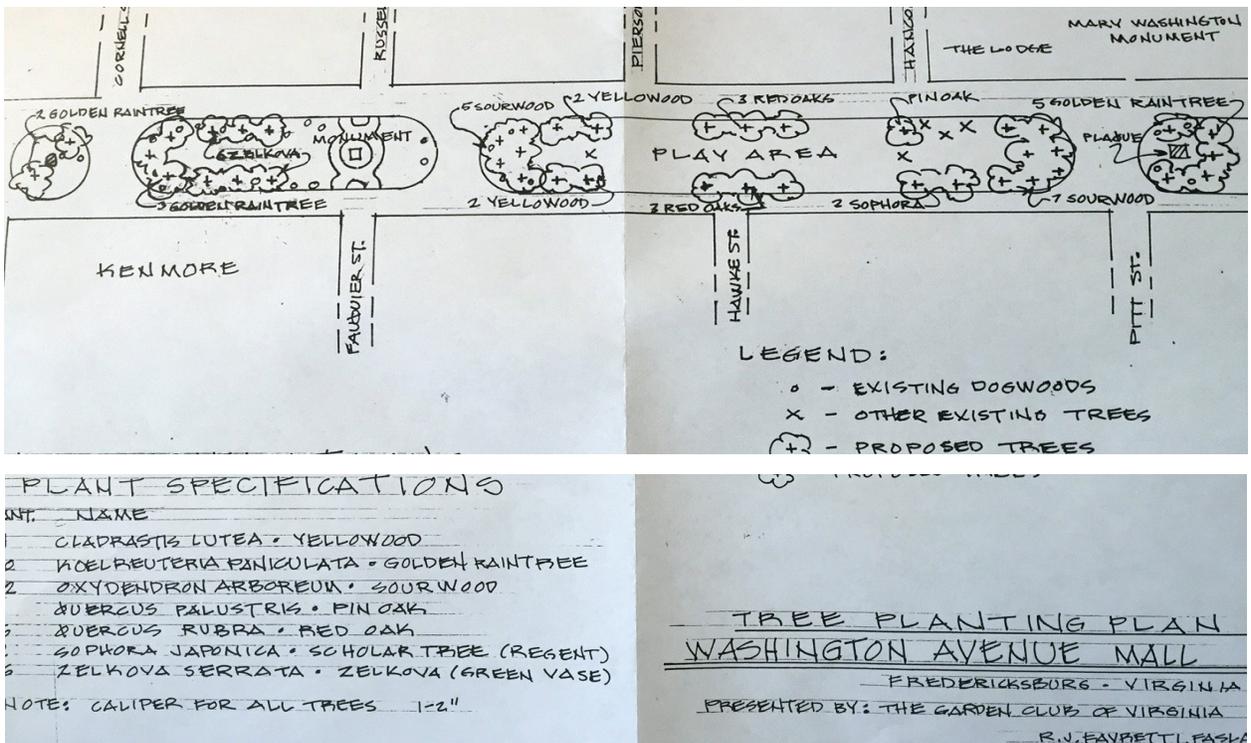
Rudy Favretti's 1996 tree planting plan for Washington Avenue.
